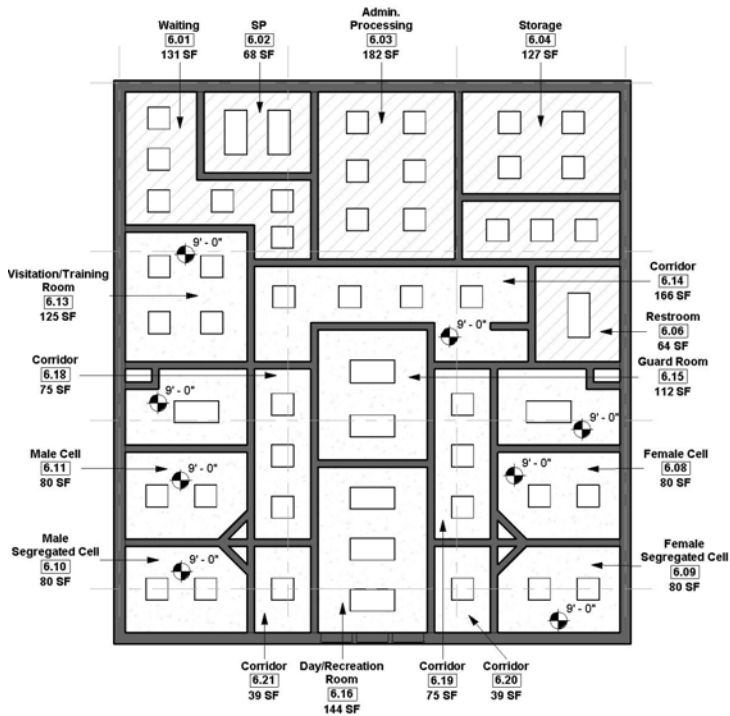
Module 6: Confinement – Refelcted Ceiling Plan
